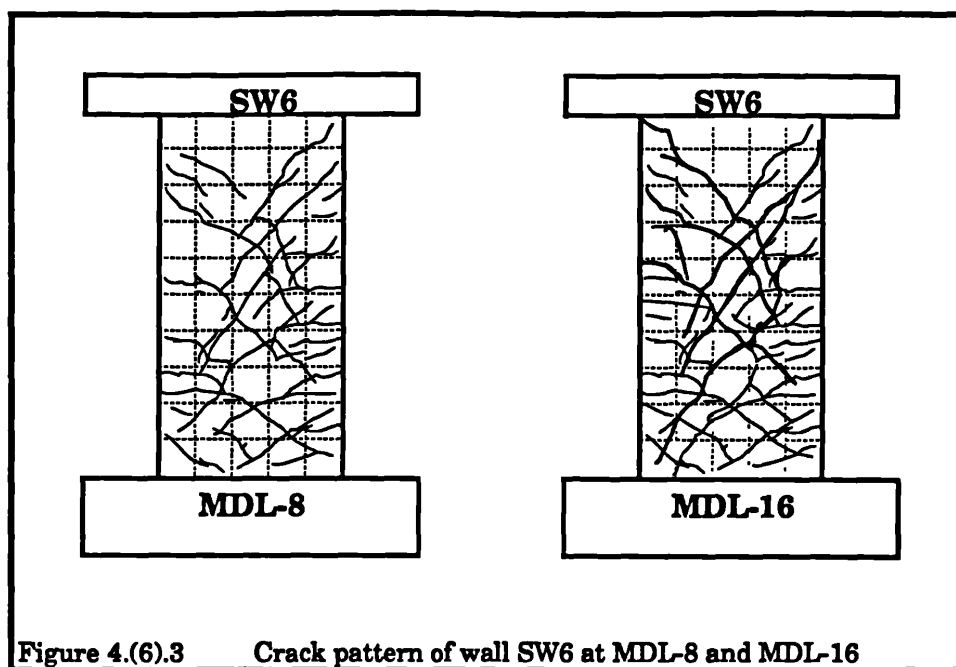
PilaSW6: DS2a - cracks at MDL-8 (yield) and MDL-16 (spalling/maximum load)
